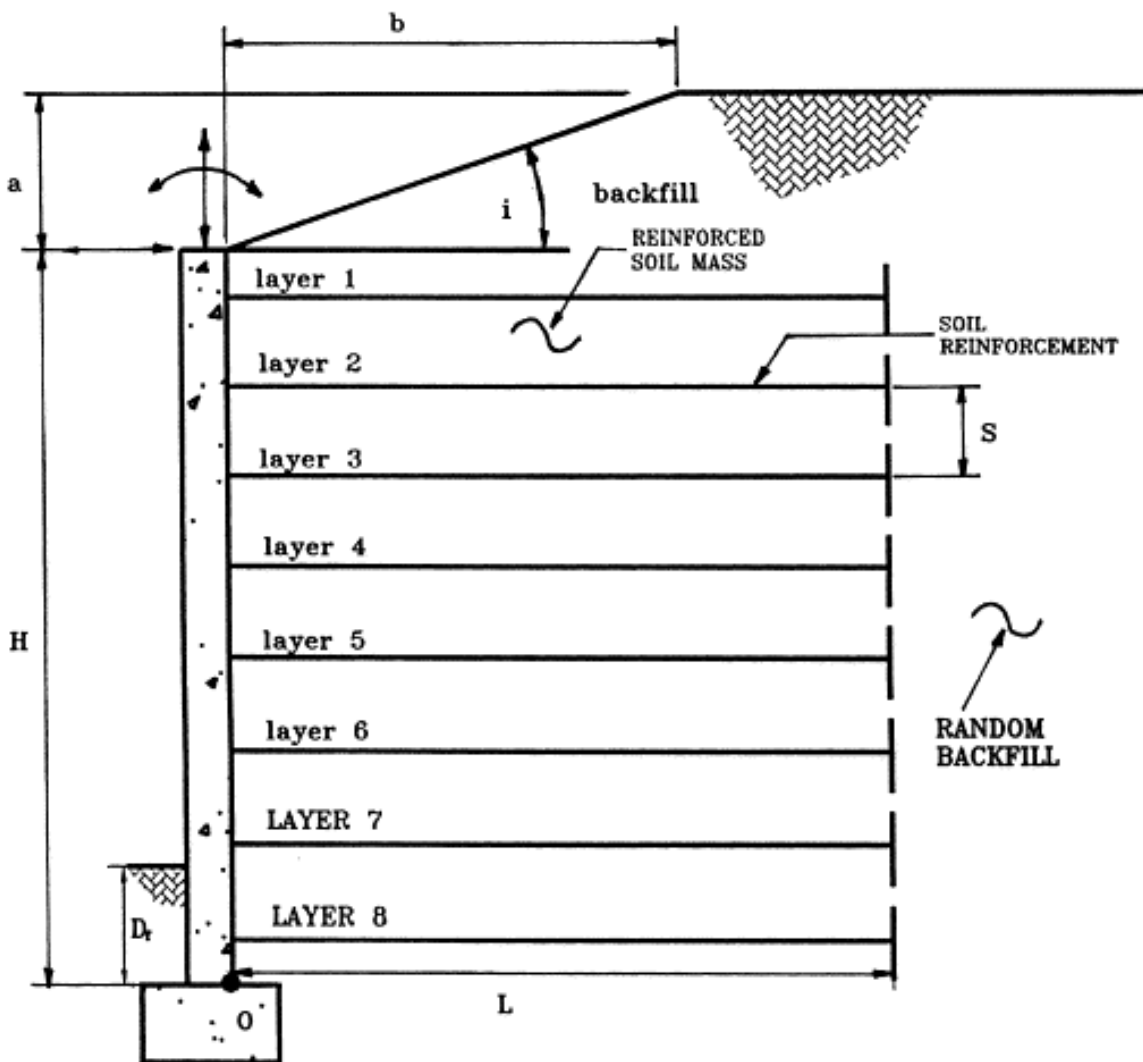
shows retaining wall with reinforcement (chen et al. 2000)
